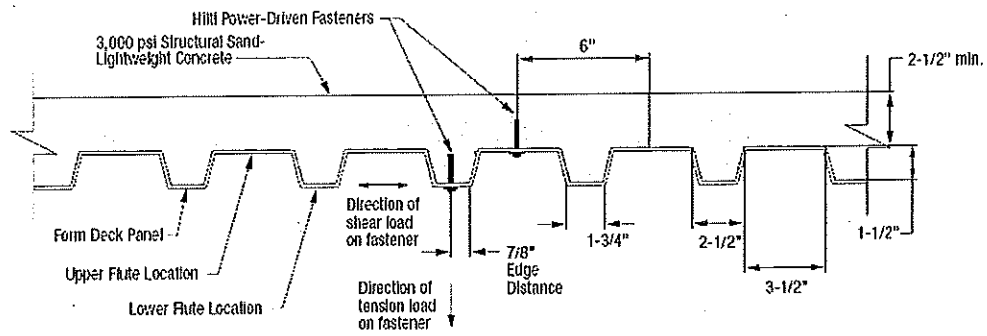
HILTI FASTENER LOCATIONS IN 1 1/2-INCH-DEEP COMPOSITE FLOOR DECK PANEL, NORMAL DECK PANEL PROFILE ORIENTATION
